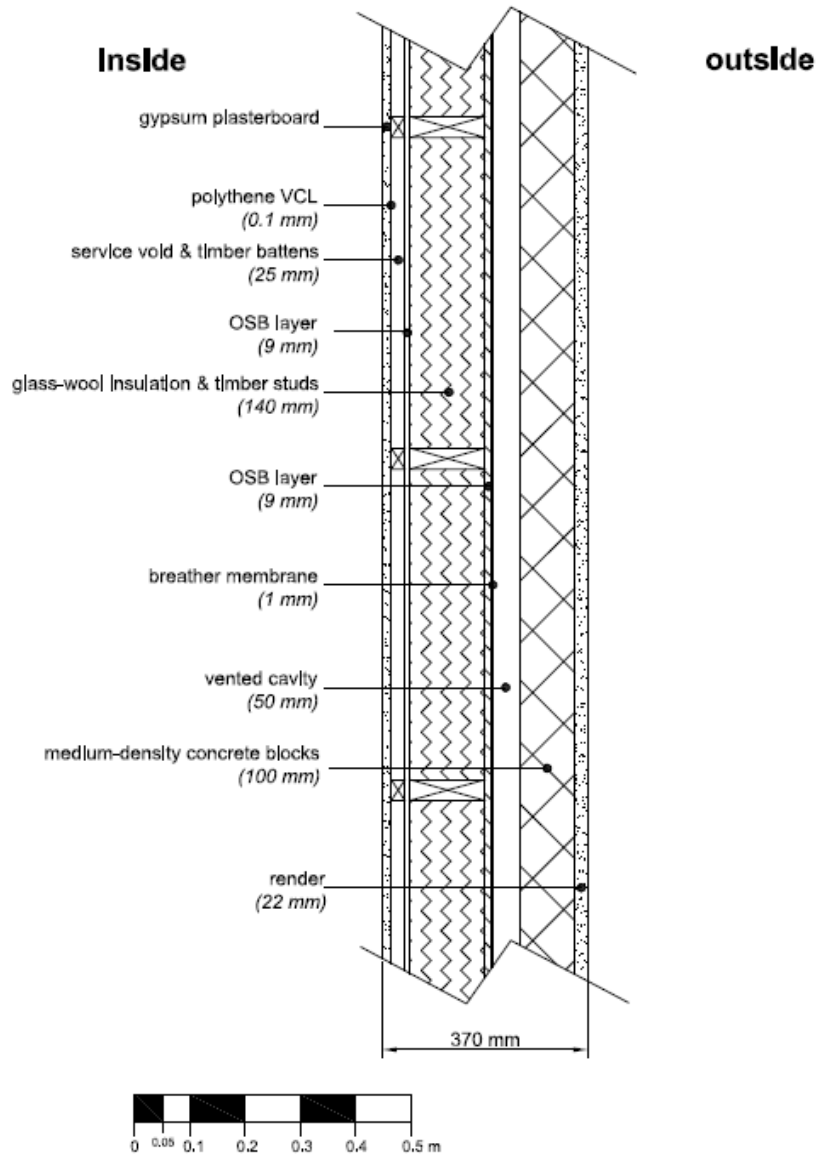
Wall B1 (closed-panel timber frame, external solution: render on blockwork), horizontal section.
